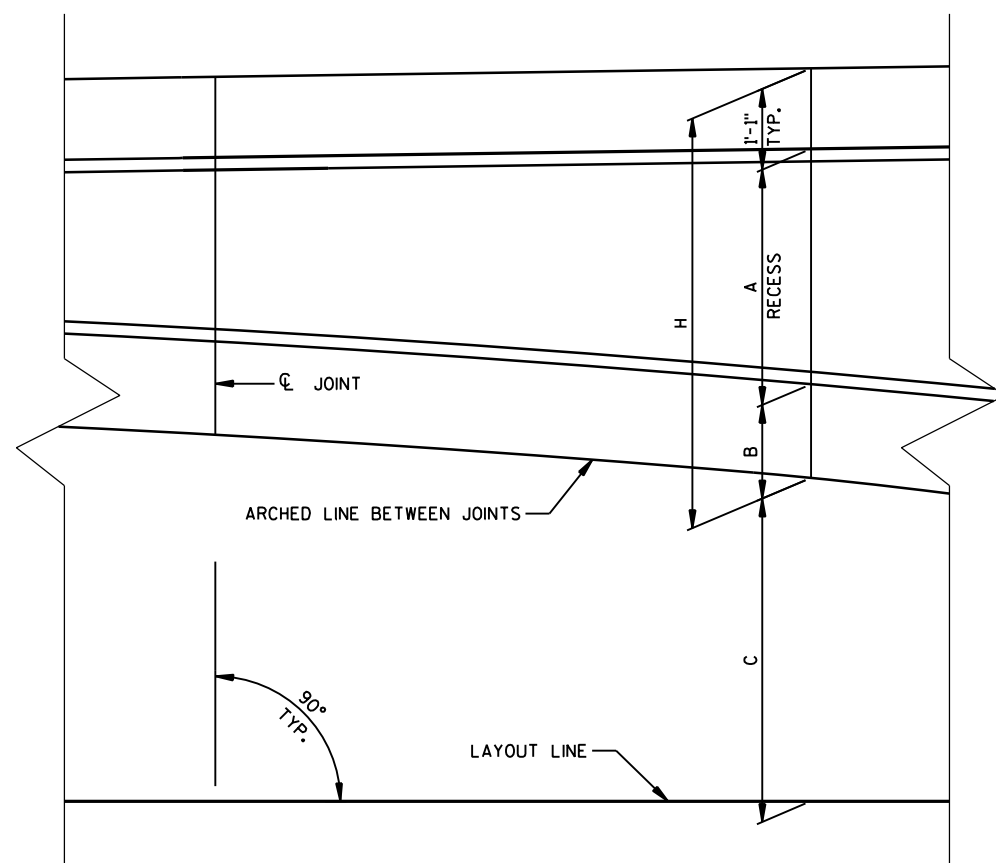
DETAILS SHOWN PLACE TOPS OF PANELS PARALLEL TO ROAD PROFILE.
